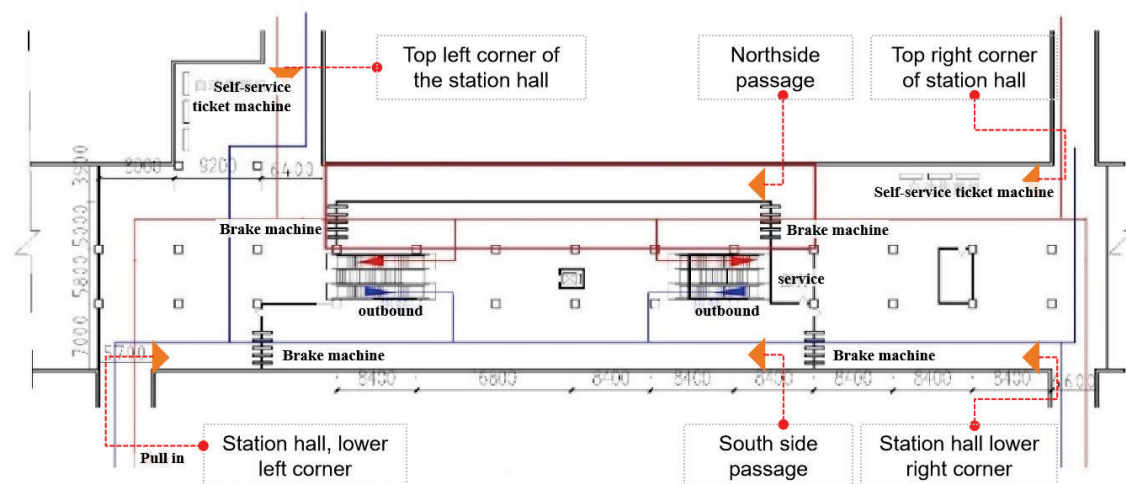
Floor plan of the station hall (Picture source: self-drawn by the author)
